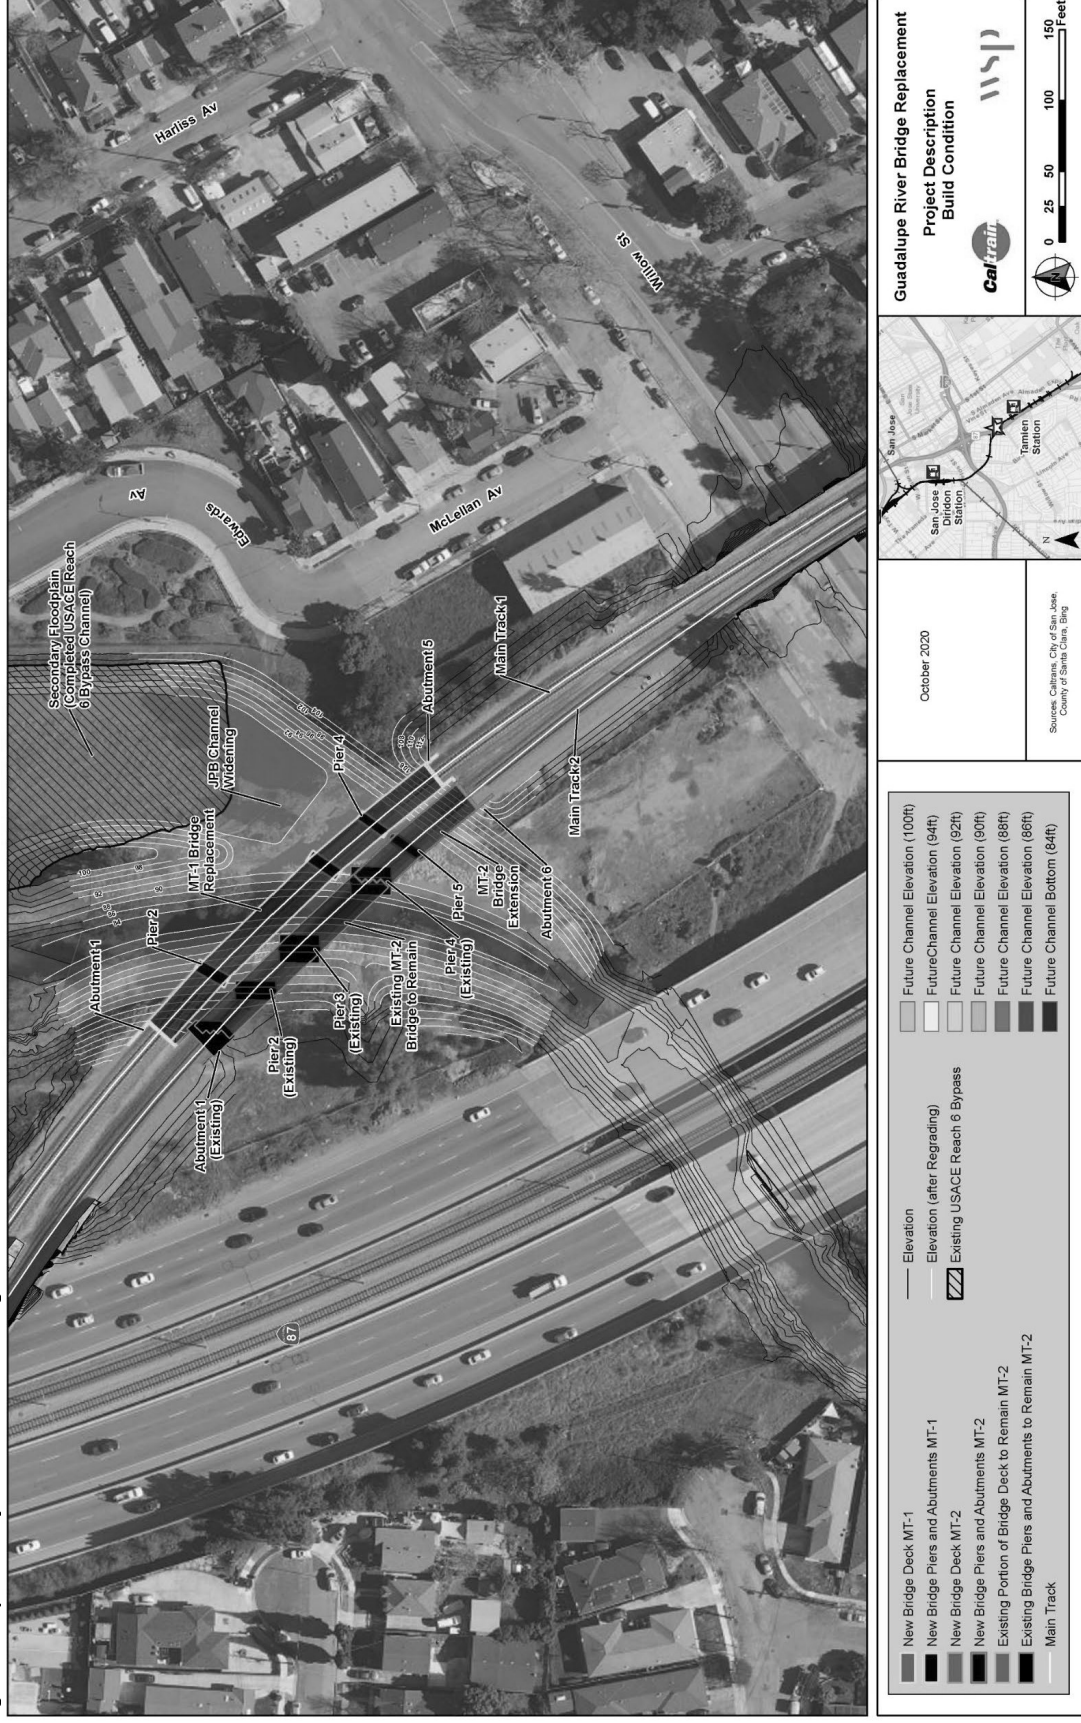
Guadalupe River Bridge Replacement Preliminary Design - Sheet 1 of 2
